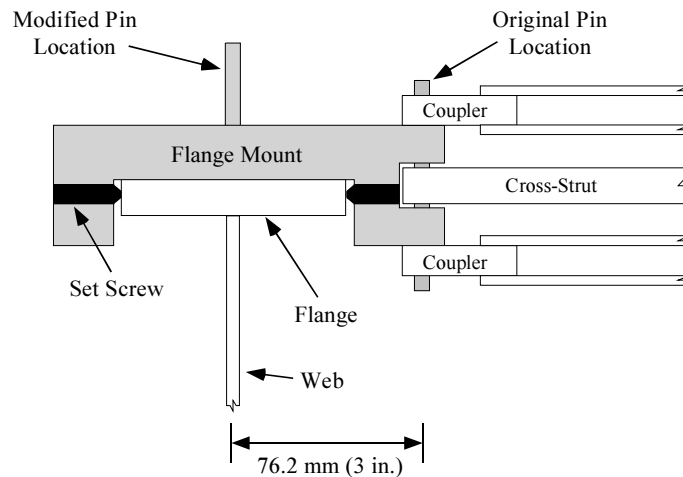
Original and Modified Flange Mount Connection (Profile)
